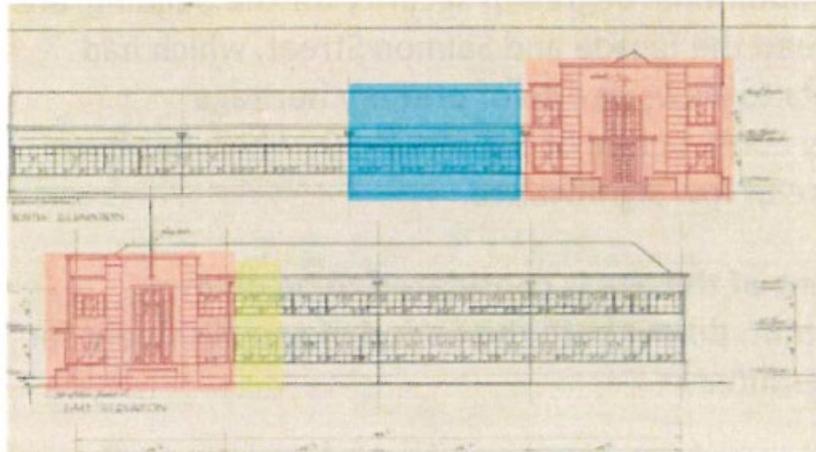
Site elevation showing Conservation Management Plan (February 2016), area of primary significance (shown red), 'four bay' section of the south elevation (shown blue) and 'one bay adjacent to office tower facing Salmon Street' (shown yellow).
